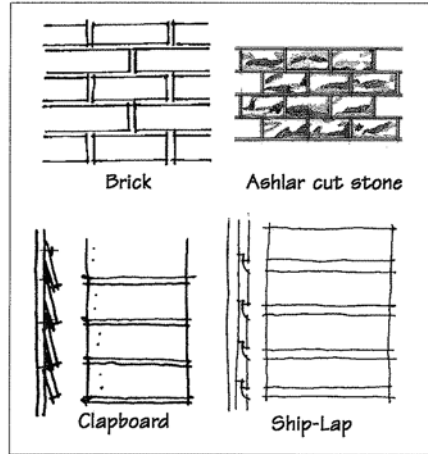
Brick, Stone, Clapboard, Ship-Lap and Stucco are just a few of the building materials found throughout the Ritzville Downtown Historic District.
